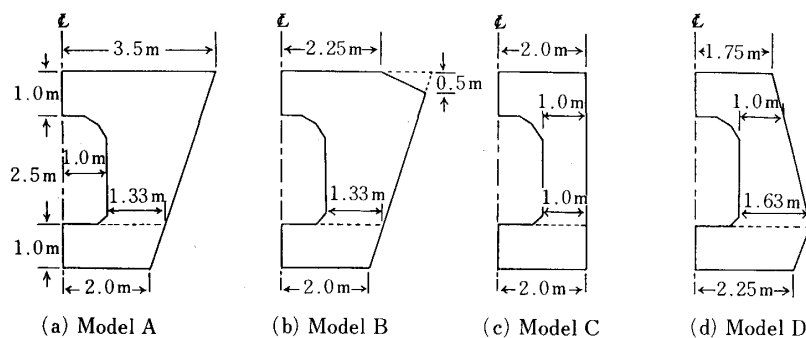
Half cross sections of culvert type inspection gallery
